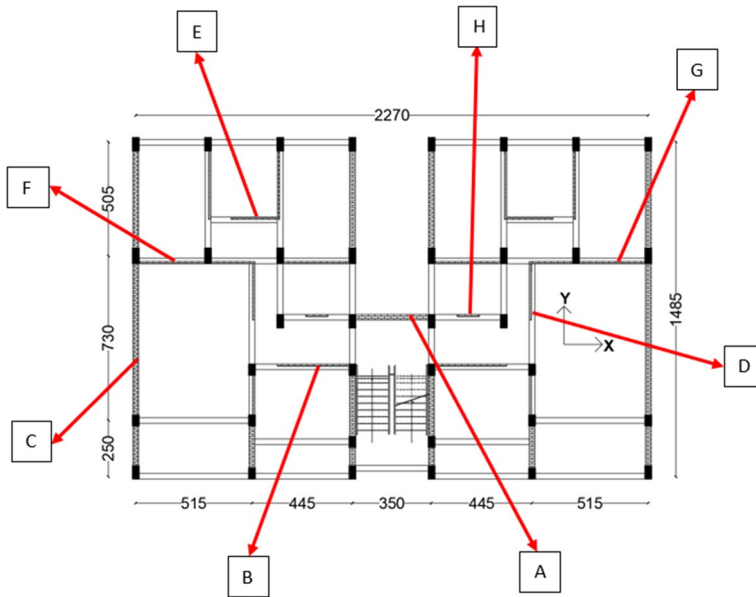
Position of the damaged infill walls in Fig. 6 on the floor plan
